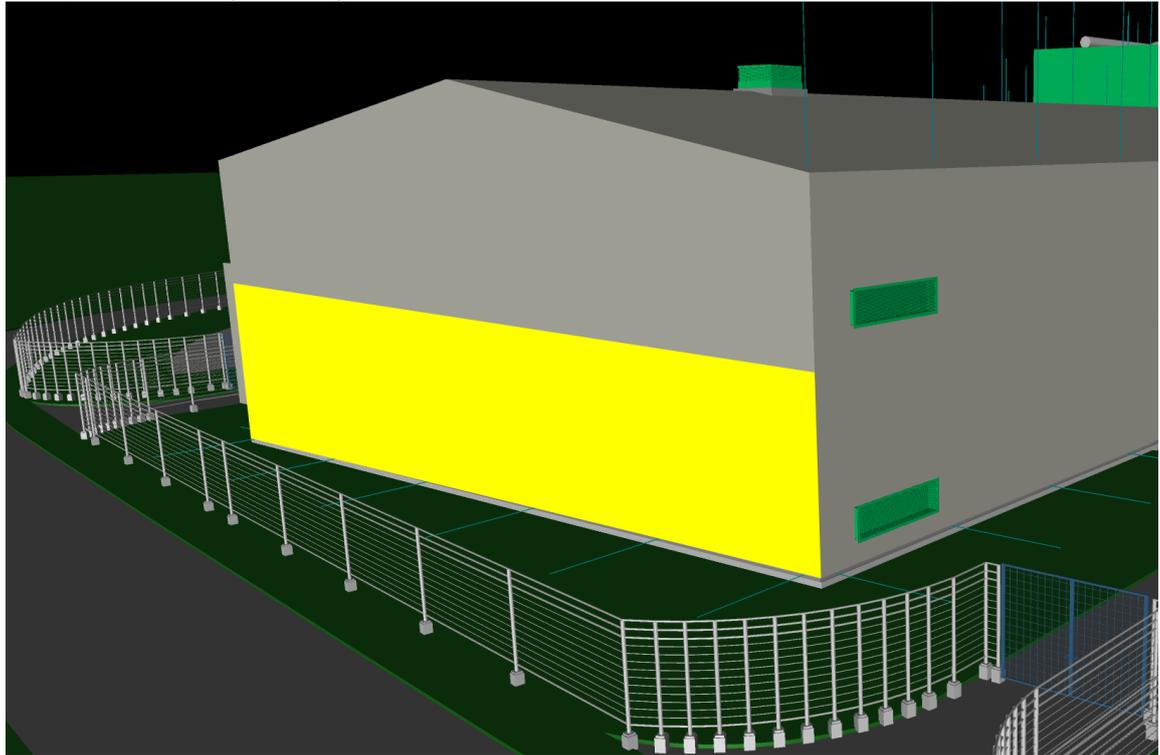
Fuel Handling Building (UEA) West Elevation 2
